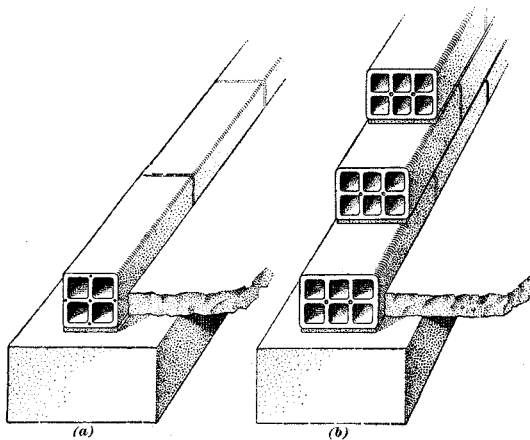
Hollow tile used in foundations (from *White and Lowndes, Hollow Tile Construction*, 31).
